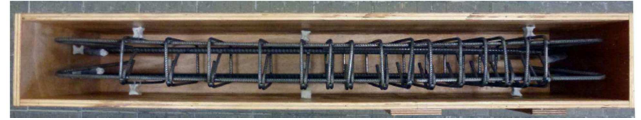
Reinforcement cage placed inside a wooden formwork with covering blocks.
